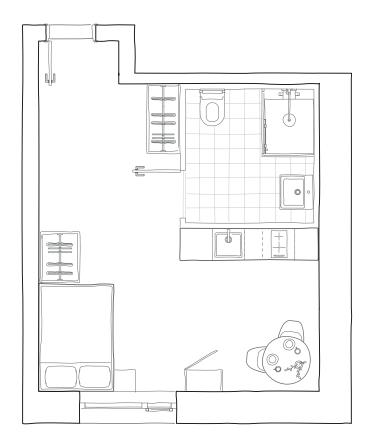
Indicative accessible co-living room plan based on a 31sqm room size
